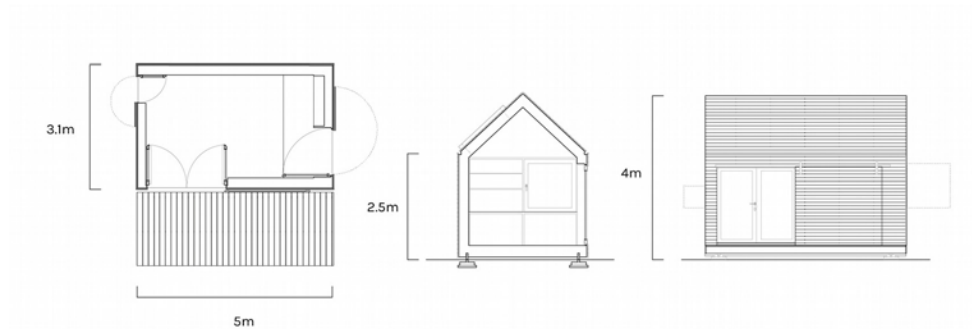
Design Drawings of the WikiHouse Studio, Version 4.1 BETA release, effective area 11.6 m<sup>2</sup>, external dimensions w 3.1 m × 5 m × h 4 m, approximate U-value of 0.15 W/(m<sup>2</sup>K) for roof, floor and walls (Design team 00 & WikiHouse, 2015; WikiHouse, 2015d).
